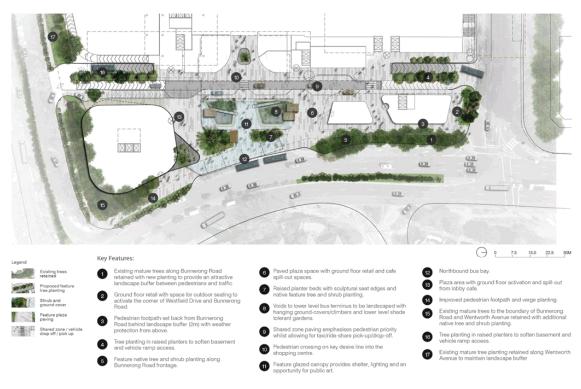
Landscape and publicly accessible areas public domain plan indicative FUTURE PLAN – should Buildings D and E be developed in the future
